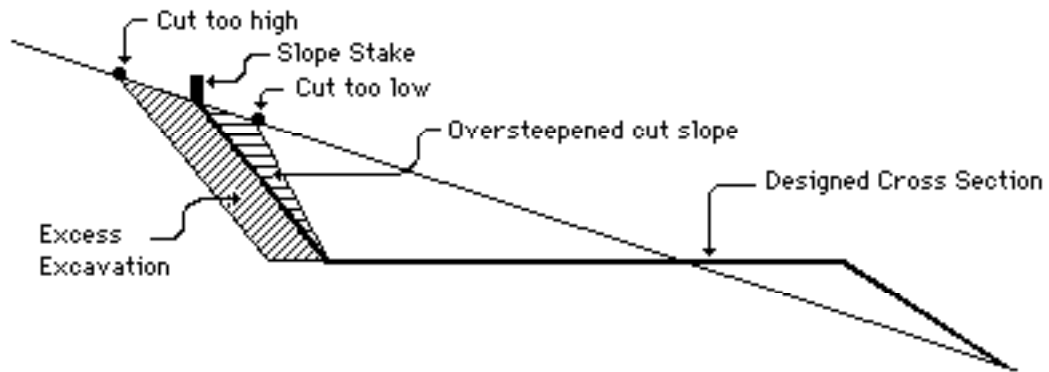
The effect of improperly starting the cut as marked by the slope stake. Starting the cut too high results in excess excavation and side cast. Starting the cut too low leaves an oversteepened cut bank.
